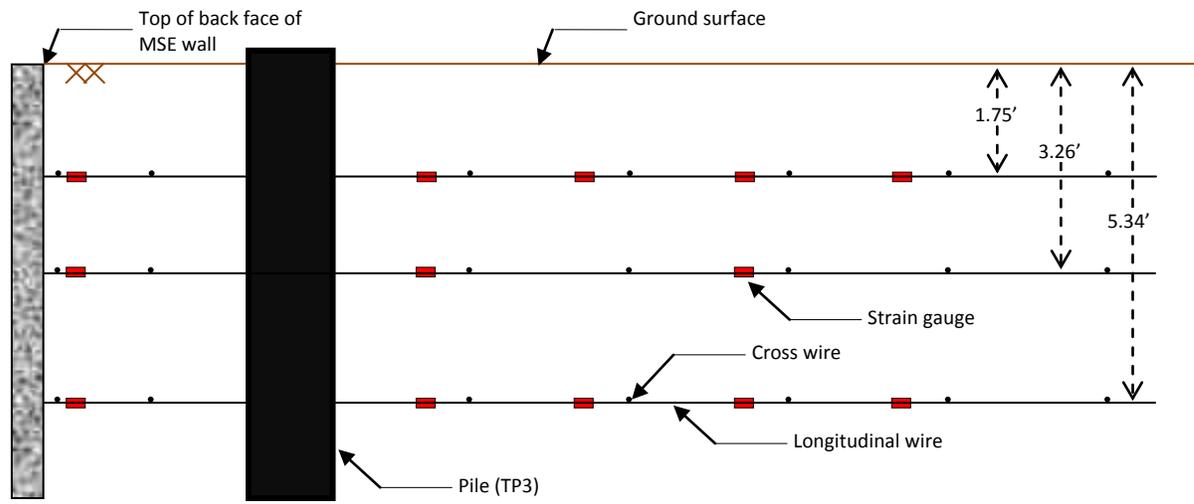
Profile view of top three layers of reinforcement at TP3; section A-A from Figure 4.2.
